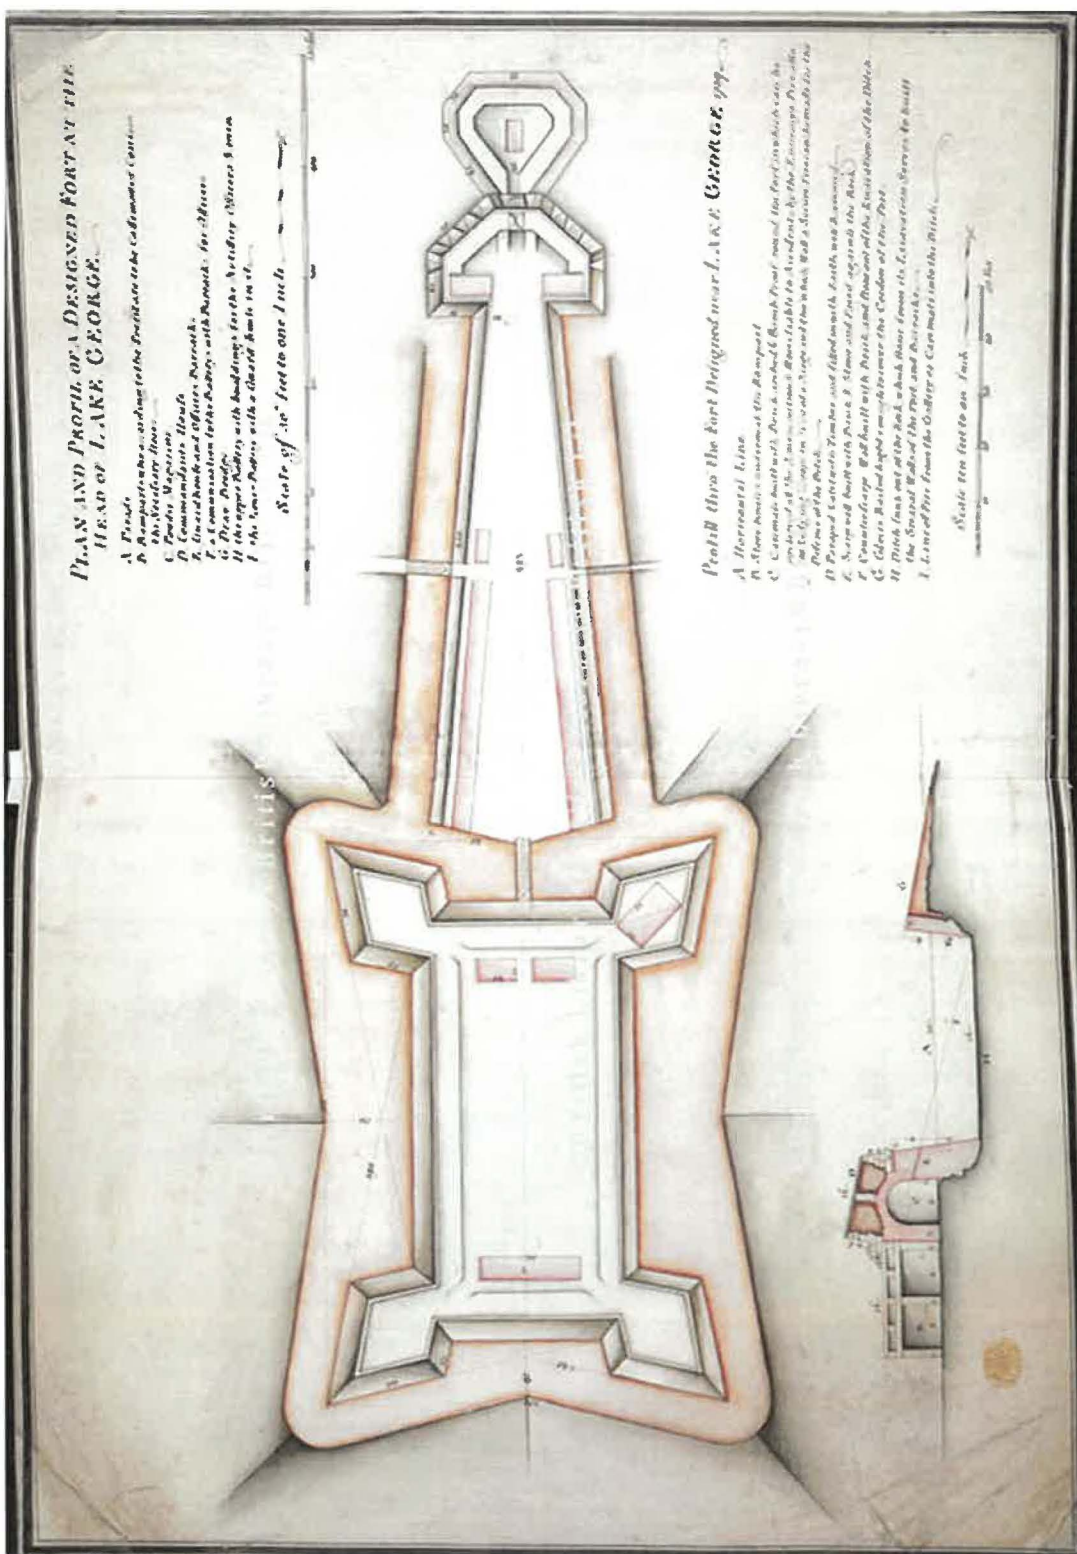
A detailed plan of the fort in 1759, with forward projecting bastions and a covered way (Brasier 1759c). This ambitious plan was scaled back almost immediately after construction began.
